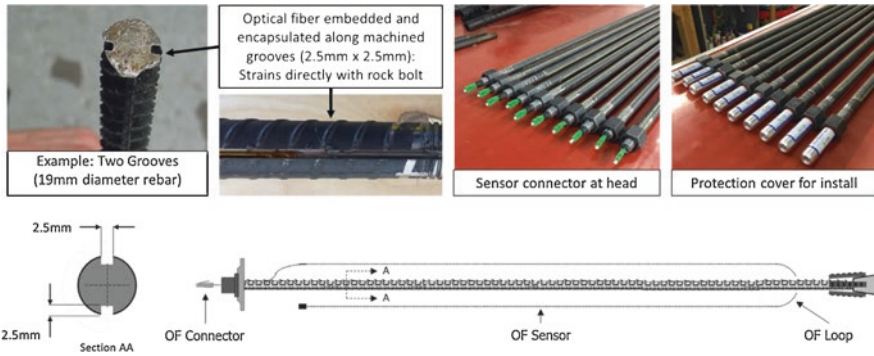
Example measures taken to protect the optical fiber sensor and sensor connector. In this case the optical fiber sensor is positioned within machines grooves cut along the length of a rebar member and encapsulated with an adhesive. A protective cover is also used to prevent the sensor connector from being damaged during installation with a bolting jumbo
